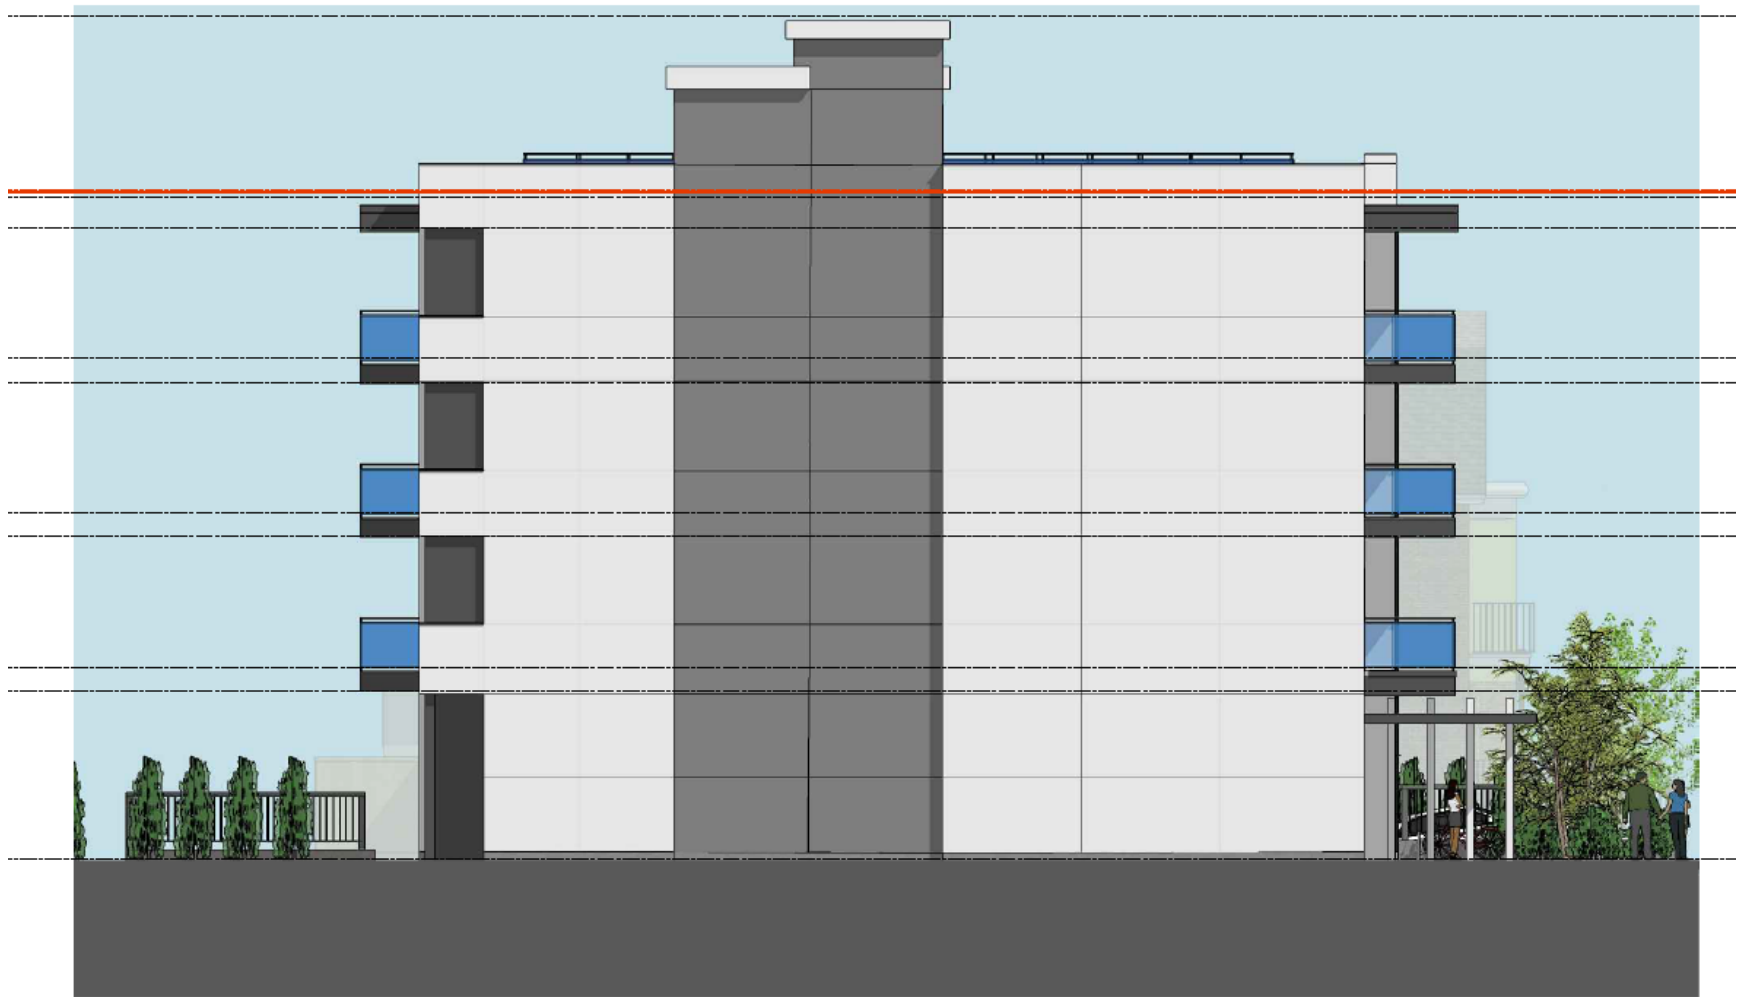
Proposed side/south elevation prepared by Hamel Design & Planning
